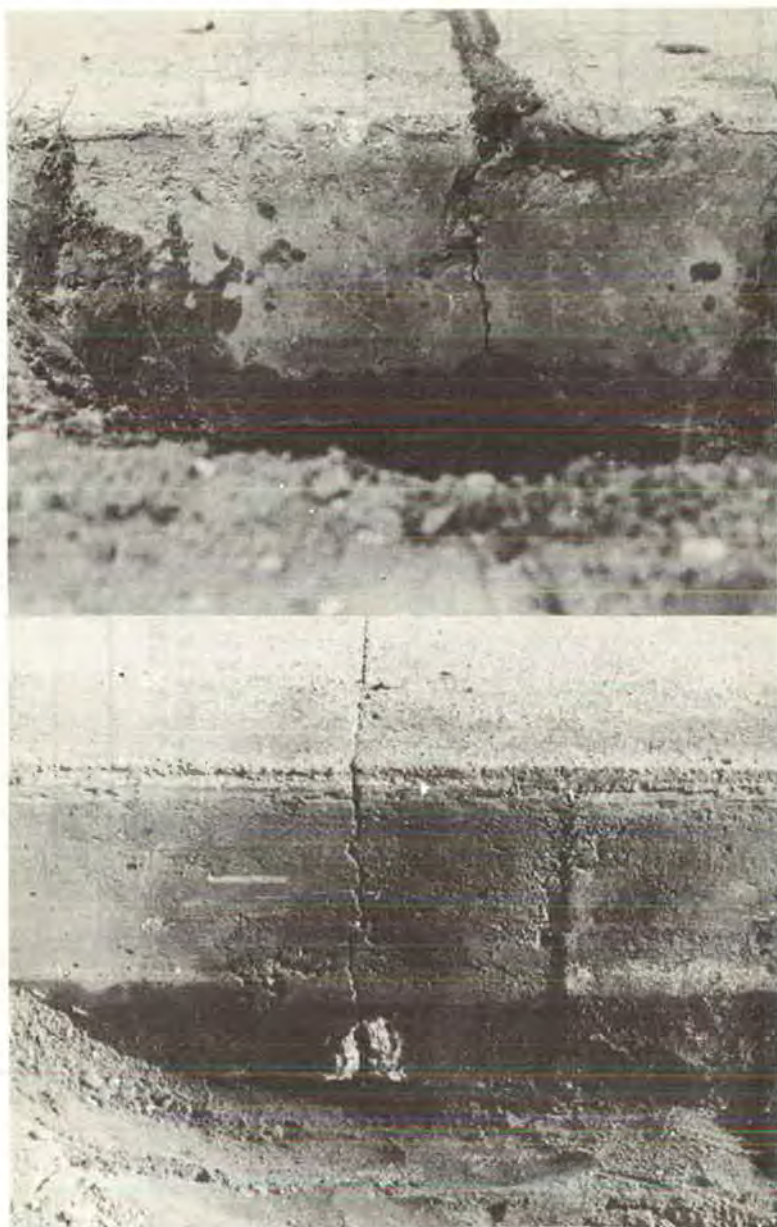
Effect of bottom parting strip on joint cracking. (Top) typical cracking at plane of weakness joint without parting strip at bottom. (Bottom) typical cracking when parting strip is properly installed.
